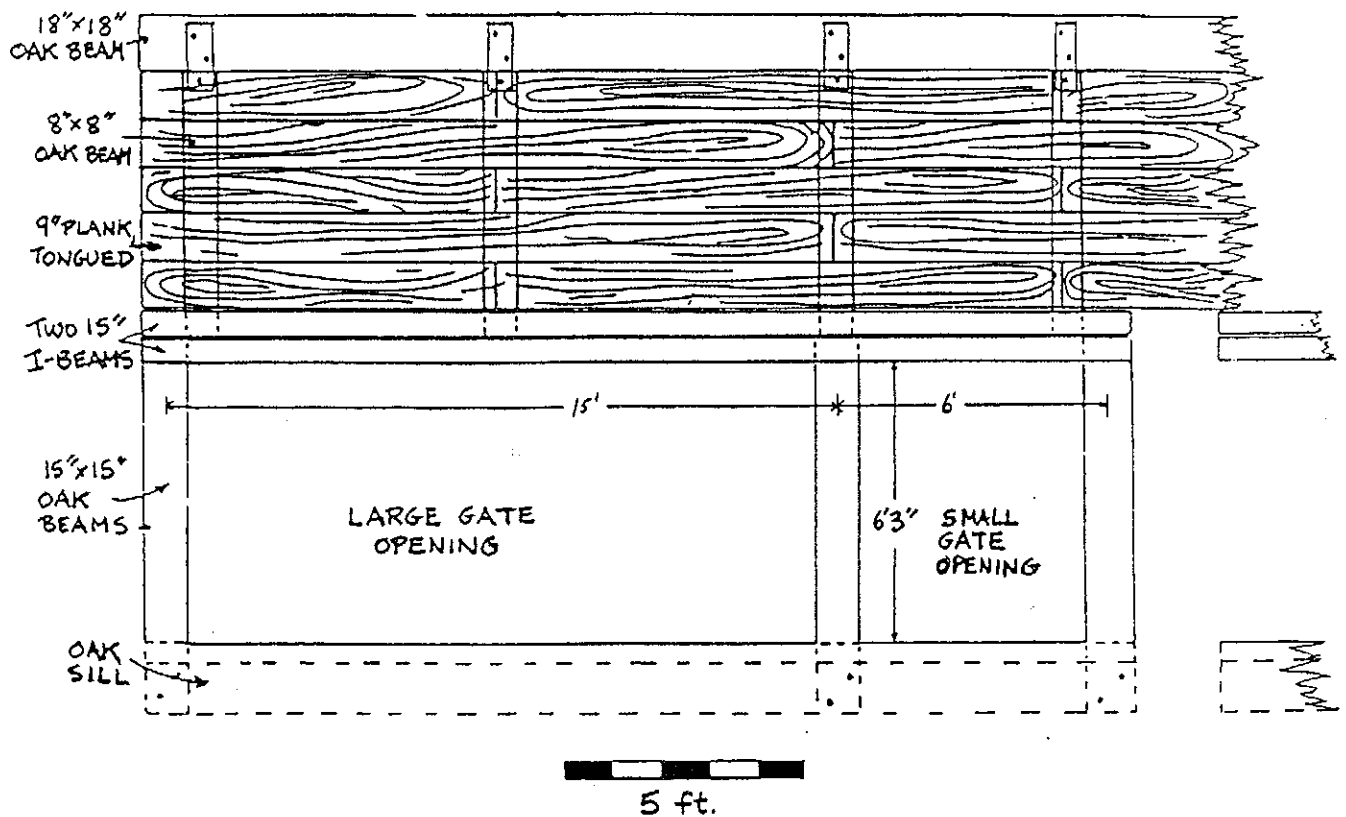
SPOOL DAM HEADGATE ELEVATION DETAILS
